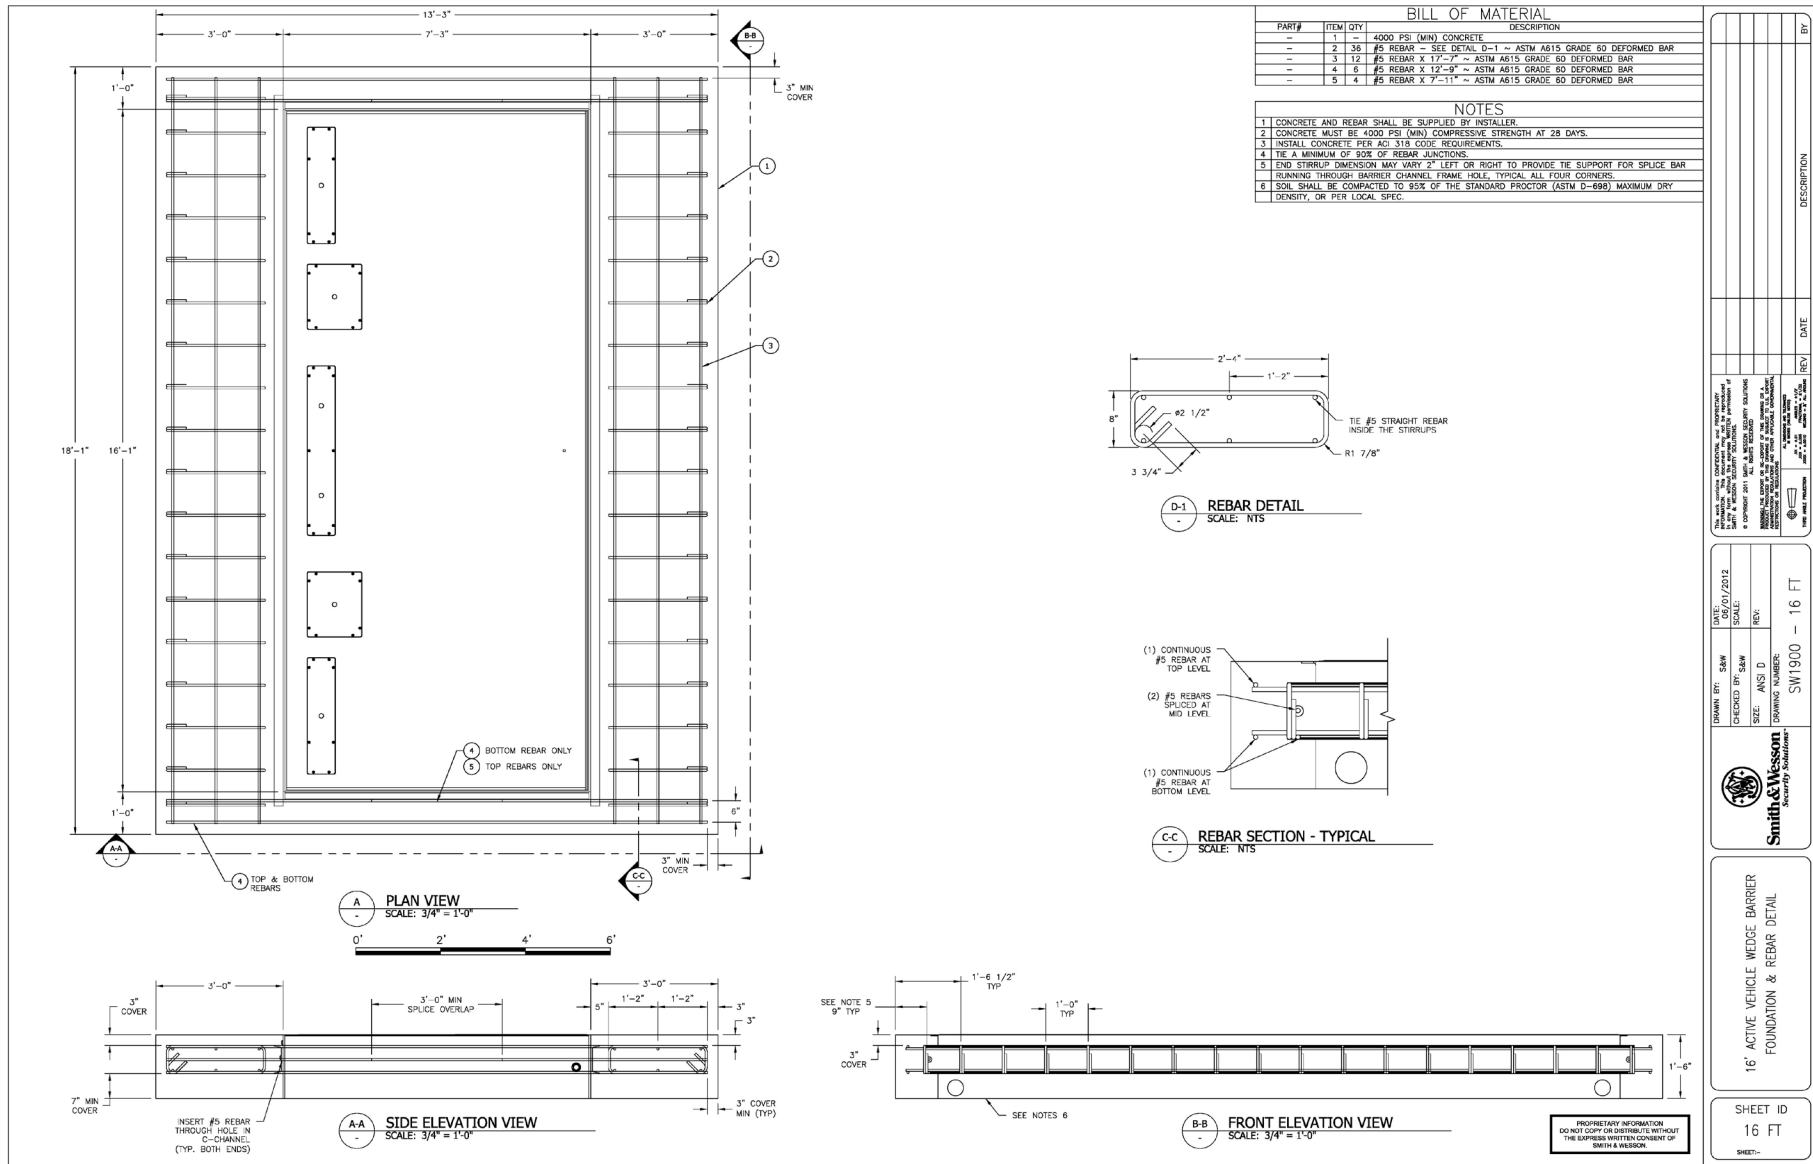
Foundation details for the Smith & Wesson 16-ft wedge system.
